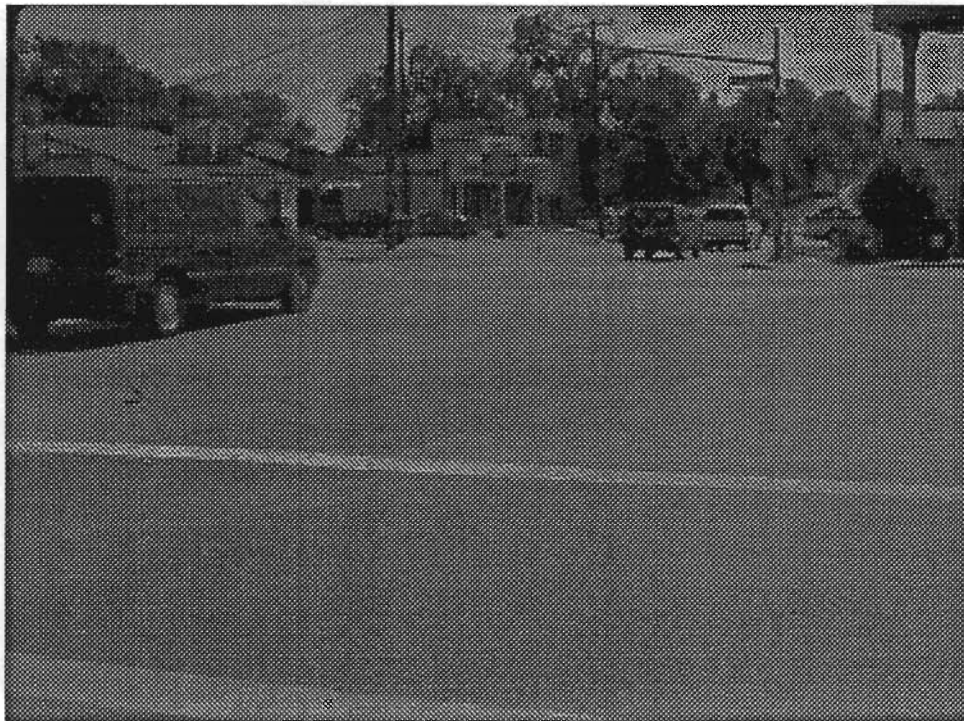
Close-up of the Asphalt Patch at Guadalupe and 29th Street Intersection
